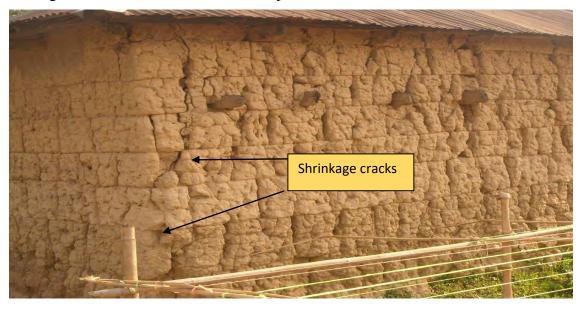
Shrinkage crack on earthen walls
